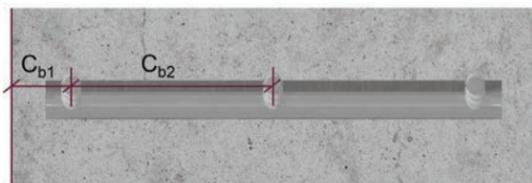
Rebar Cover — HAC CRFOS U — Plan View
